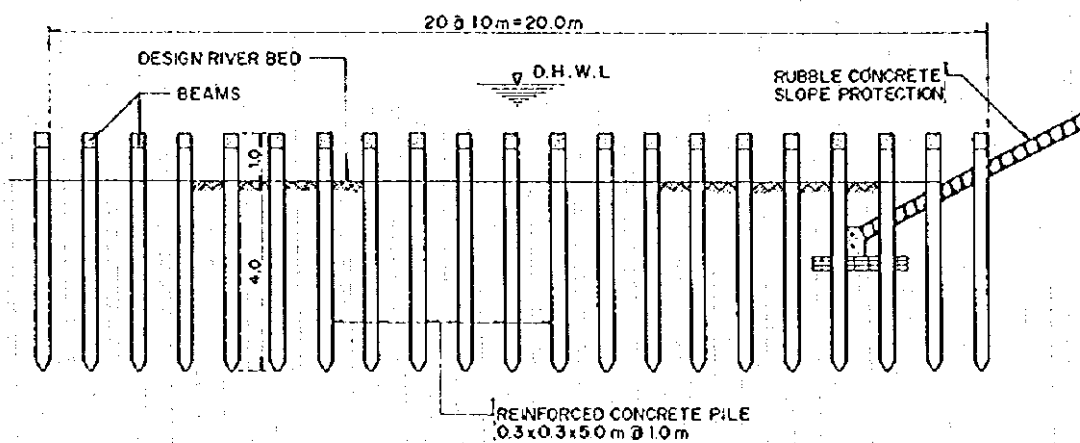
Proposed Slope Protection with Rubble Concrete
